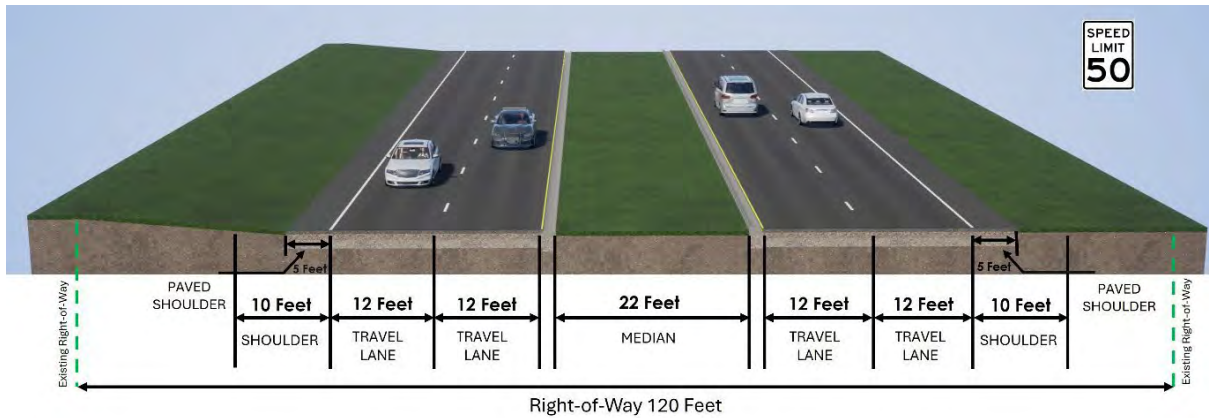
Existing Roadway Typical Section: North of DeSoto Bridge
